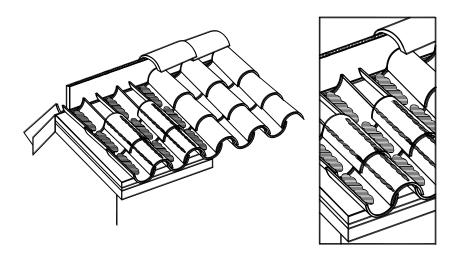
Placement Detail "D" Two-Piece Profile Roofing Tile
